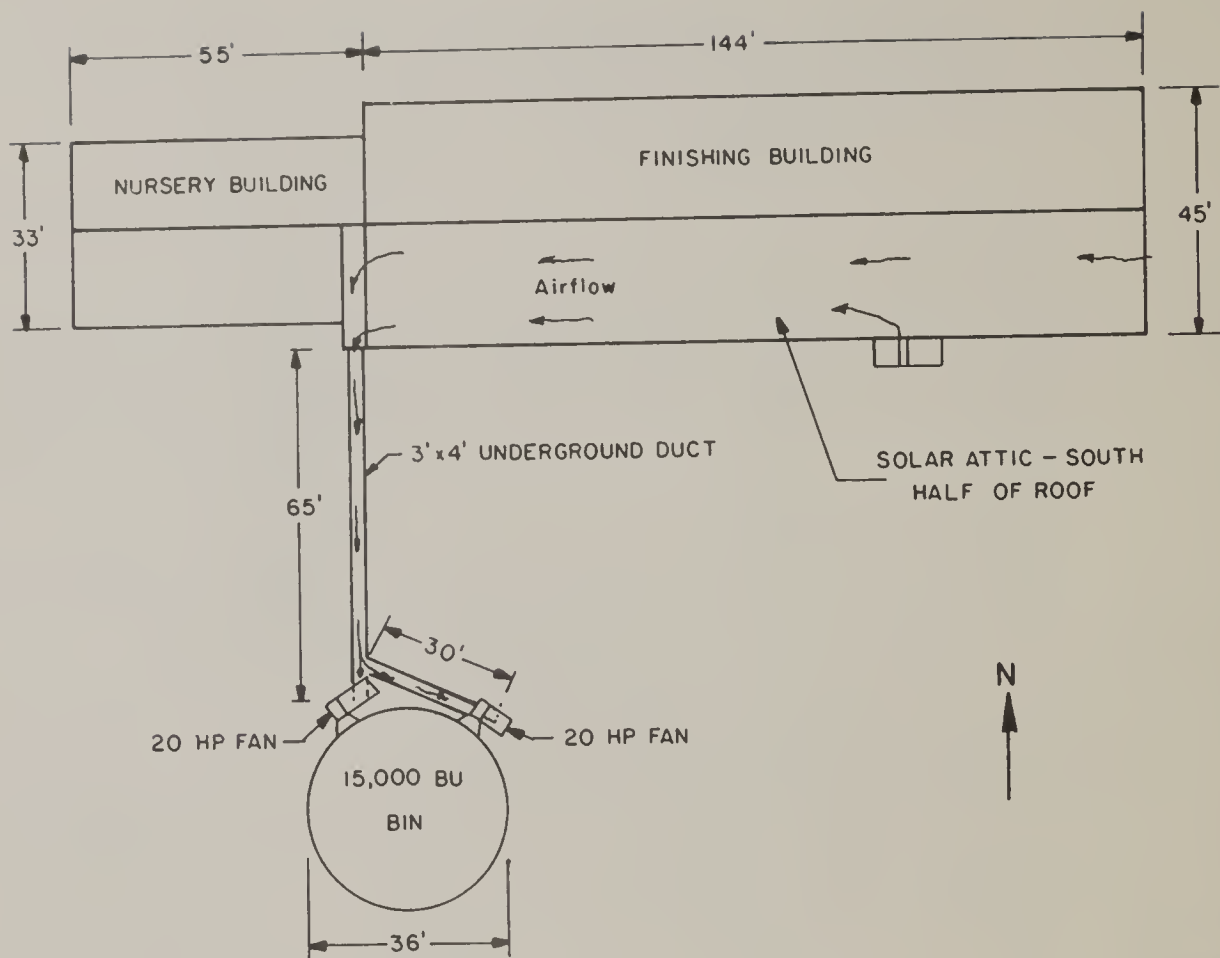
Plan view of drying bins, finishing building, and nursery building on the Lindsey farm.
